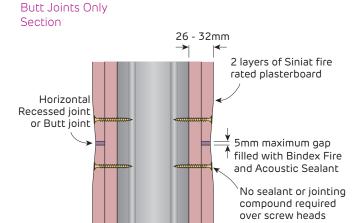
Horizontal Joints in Double Layer Wall Systems
